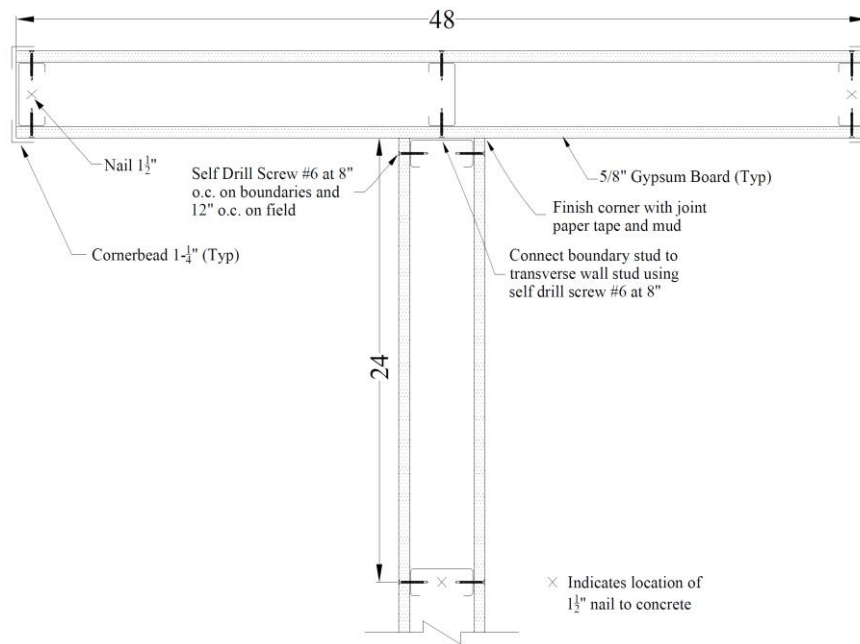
Adopted details for flexible track specimens at junction with return walls (dimensions in inches) from study by Davies et al. (2011).
